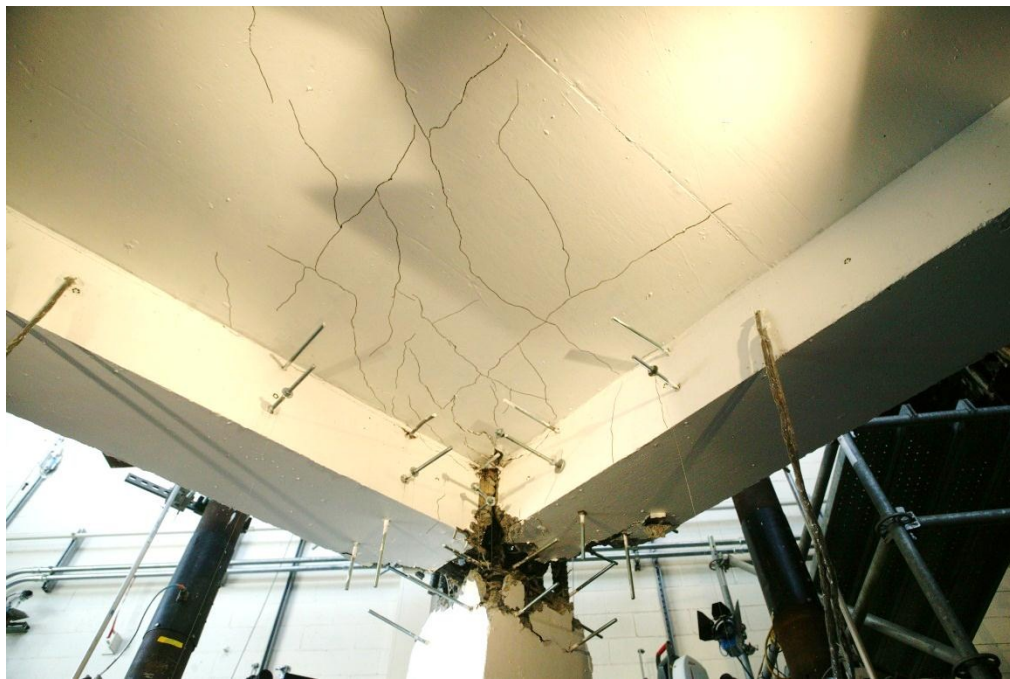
shows the torsional cracking of EW beam in specimen U-J-1 during NS beam downward loading. Beam crack pattern is similar to that in formerly presented specimens. The characteristic difference in cracking of specimen U-J-1 from other specimens that did not undergo very large drift is the slab crack pattern shown in Fig. 7.153. It can be observed that slab cracking due to twisting restraining effect is similar to other specimens, however, some other diagonal cracks stemming from the column internal apex adjacent to slab can be observed. These are shear cracks that developed due to very high drift in specimen U-J-1. Since concrete slab was lightly reinforced to mimic older construction, the diagonal shear cracking reinforcement at slab corners was not provided. This evident slab shear cracking confirms the appropriateness of providing corner shear reinforcement in concrete slabs to overcome diagonal tension stress concentration at the corner.
